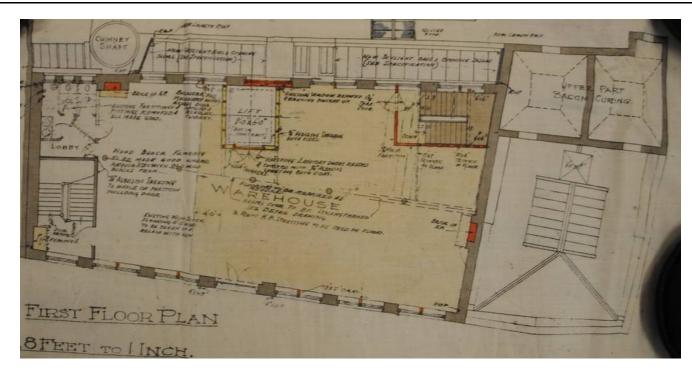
1918 plan first floor plan showing glass roof of 10 Hayne Street (Source – LMA, GLC/AR/BR/22/BA/043620)
